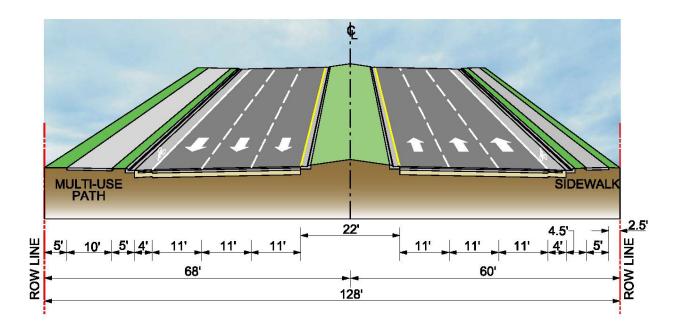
SIX-LANE DIVIDED TYPICAL URBAN SECTION THROUGH PROMENADE TOWN CENTER
